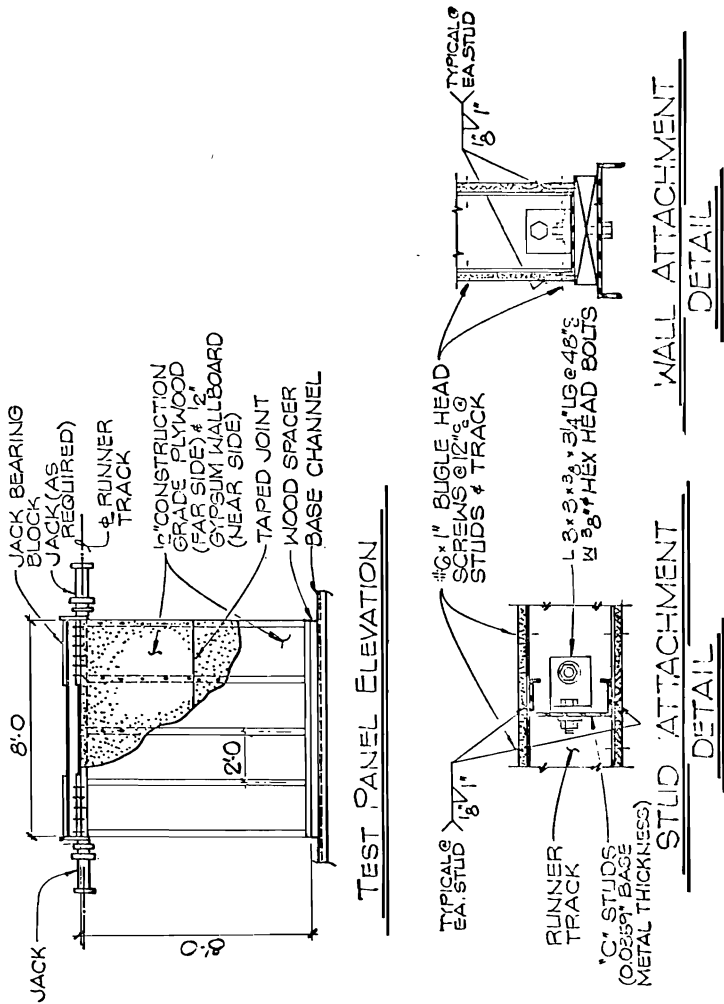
Test Assembly Plan & Details - Wall Type "N"
